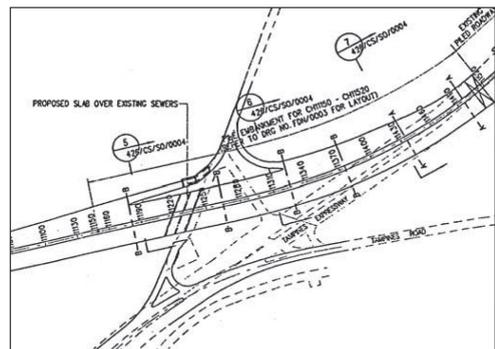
Site Plan of proposed GRPE section in KPE-C426 (obtained from LTA, Singapore).
